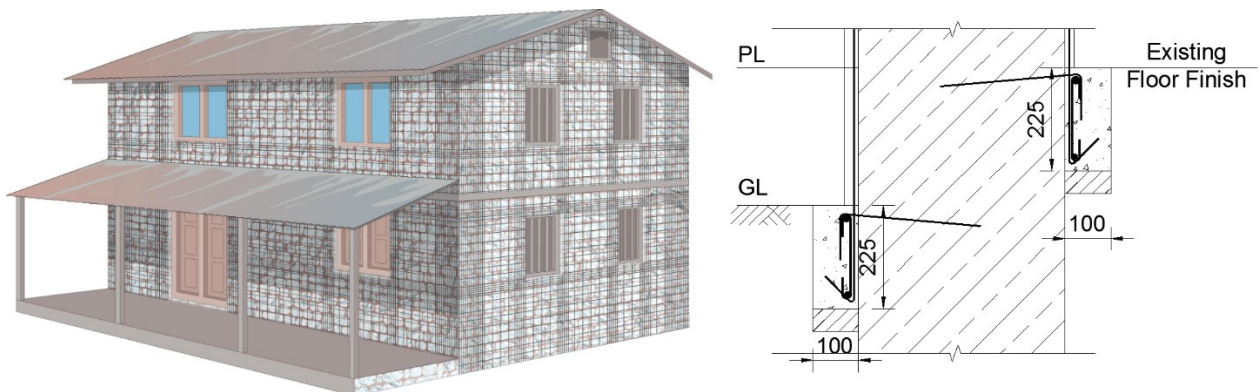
Illustration of a typical WWM layout (left); Typical RC tie member at the base showing through anchor rods (right)
